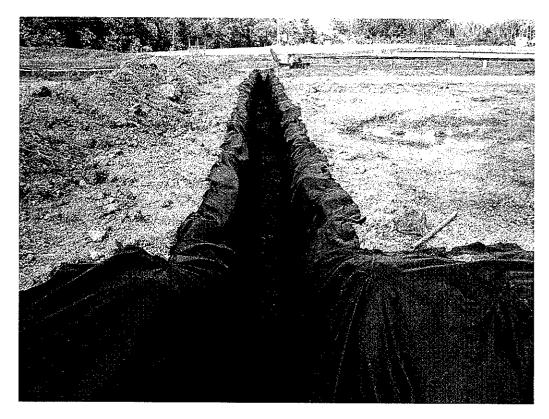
Phase II – Excavation and marker layer for Electrical Conduit Installation.
